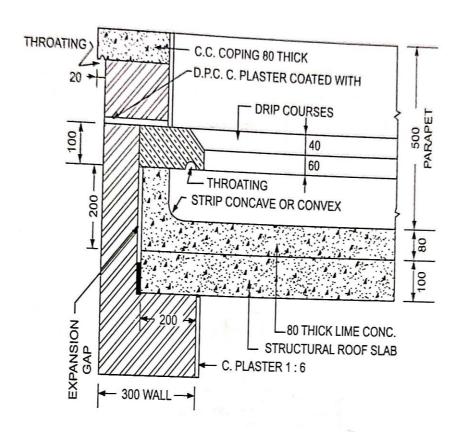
R.C.C. STRUCTURAL SLAB WITH LIME CONCRETE FINISH
